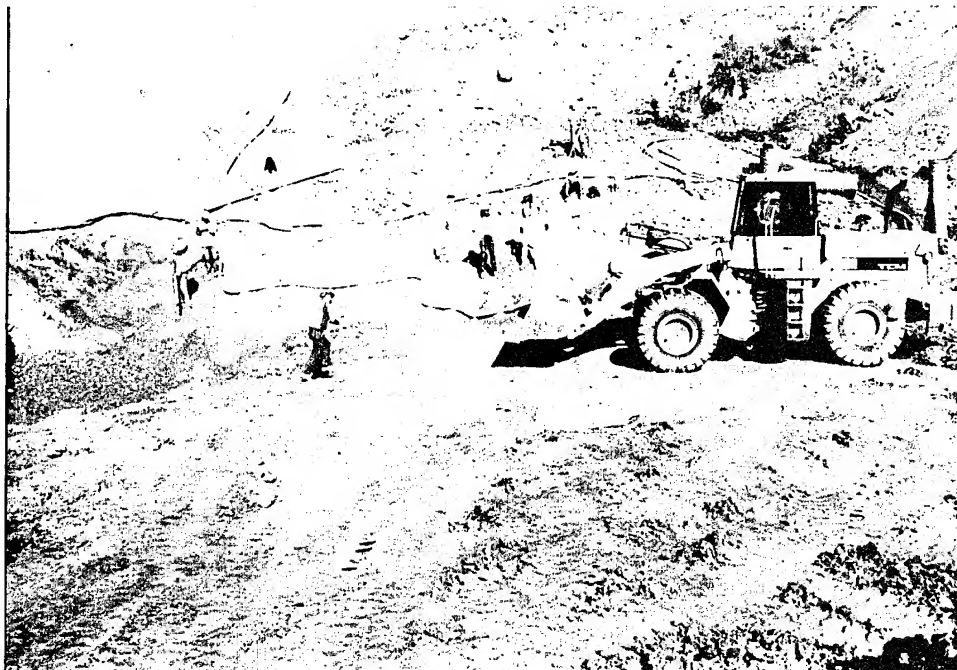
Mesco 870 front end loader wheel rolling impervious core against core trench abutment. Photo looks at right abutment approximate Sta. 22+50. Front edge of bucket is near centerline.
